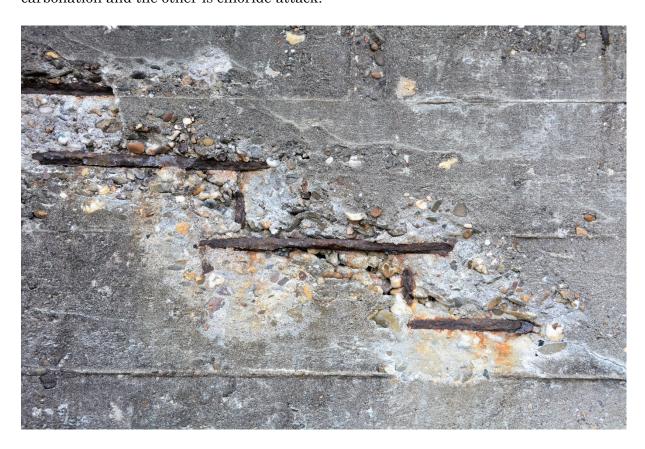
Corrosion in concrete wall due to carbonation
